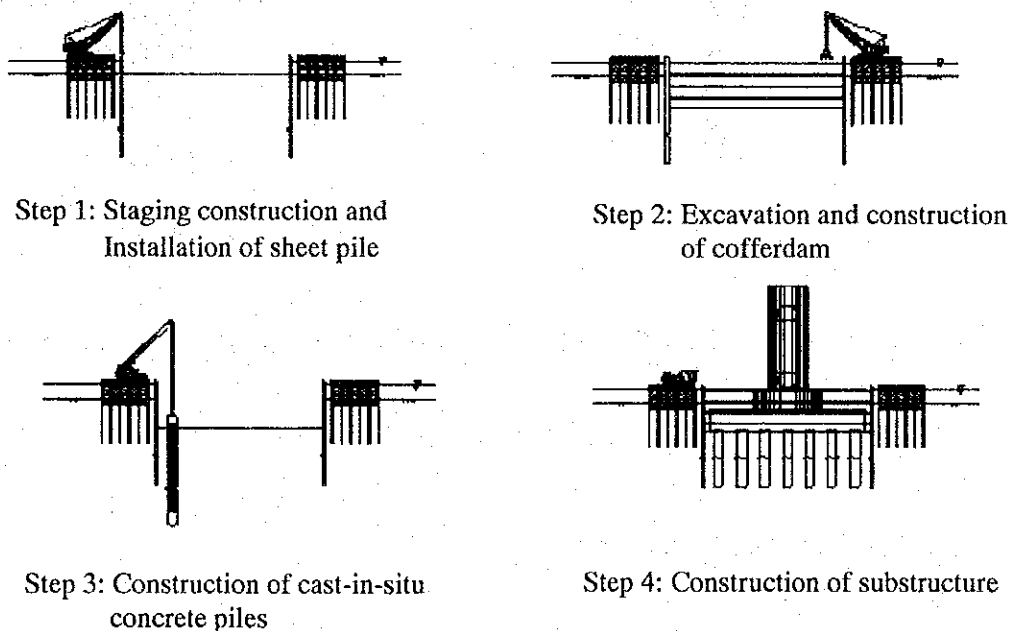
Construction Procedures for Substructure / Foundation for Main Bridge
